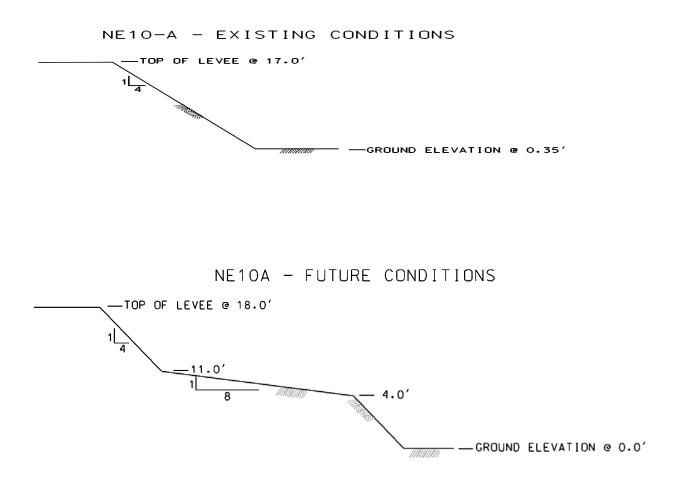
Typical Levee Design Cross-sections South Point to Hwy 90 Levee (NE10-A)
